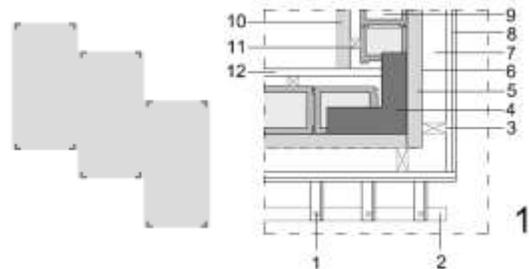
The structural L shape supports grid at floor level and a detailed horizontal section of the SMLsystem house (Sept 2011)
